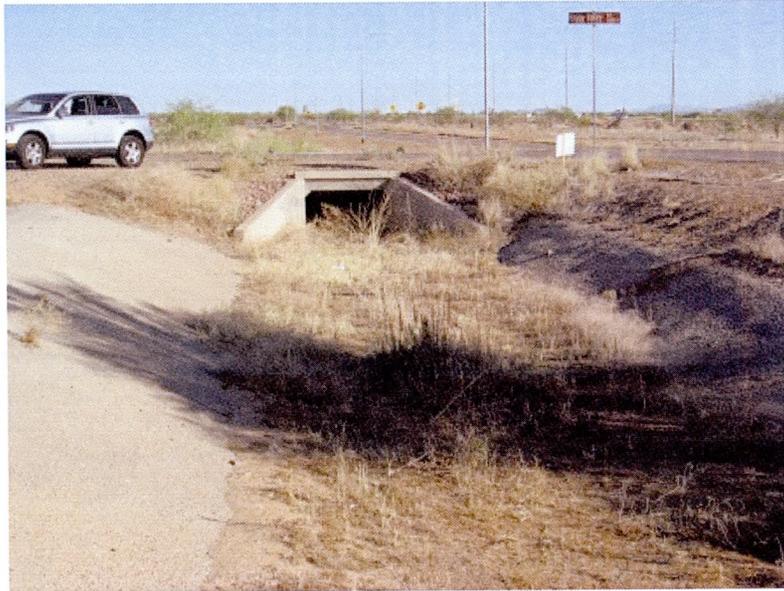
Looking NW at the outlet end of culvert listed in #253 on south side of Old Happy Valley Road.
